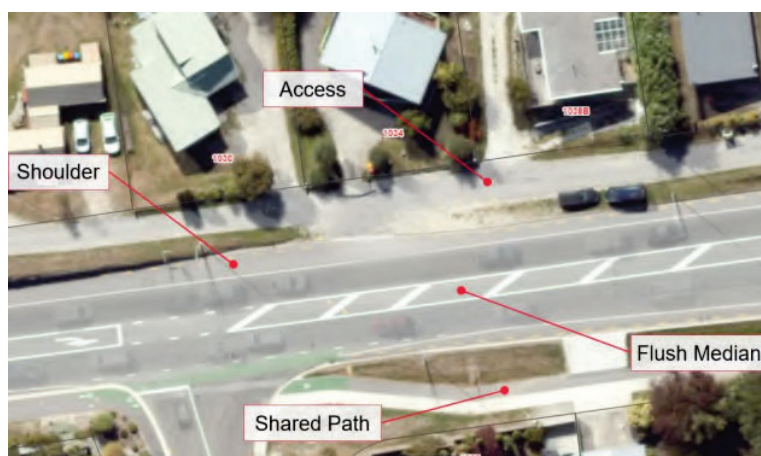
SH6A Access (Source: QLDC Map Navigator)
